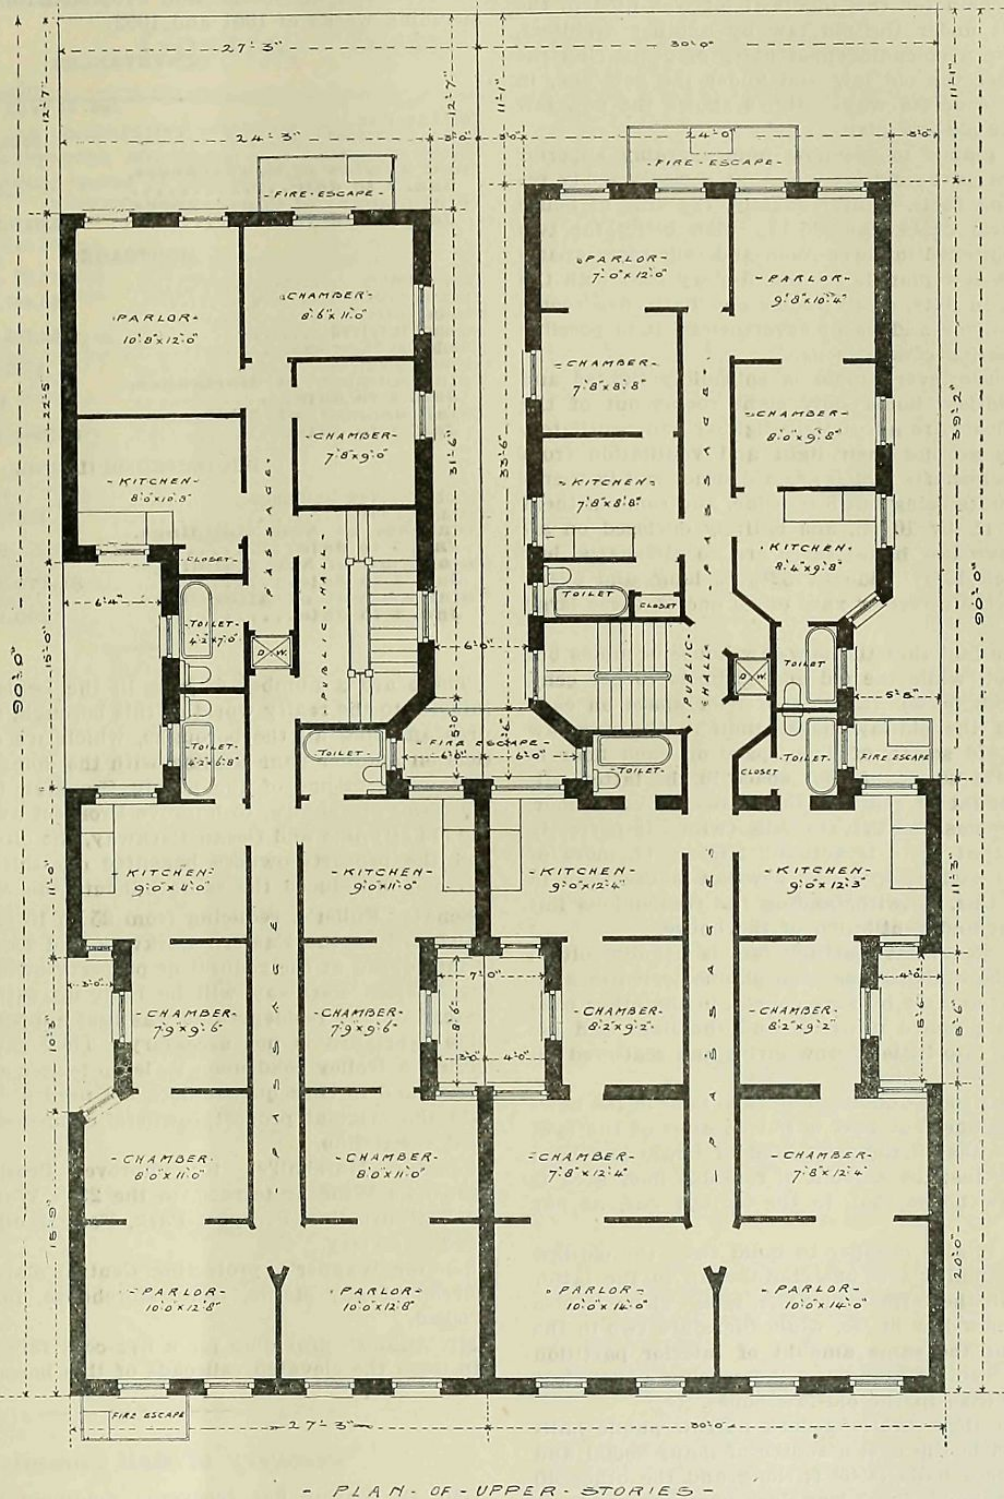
½. PLAN FILED FOR TWO TENEMENTS UNDER THE OLD LAW AT NOS. 6-10 BARROW STREET.
